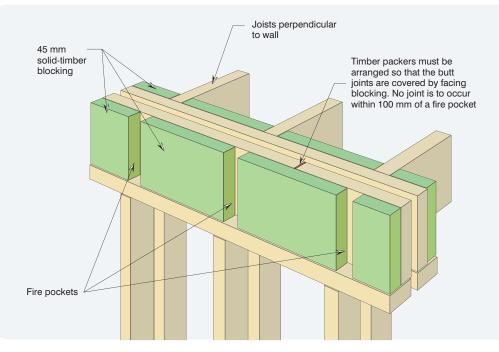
Fire pockets in fire- and sound-rated wall – FRL 60 minutes – elevation view.
